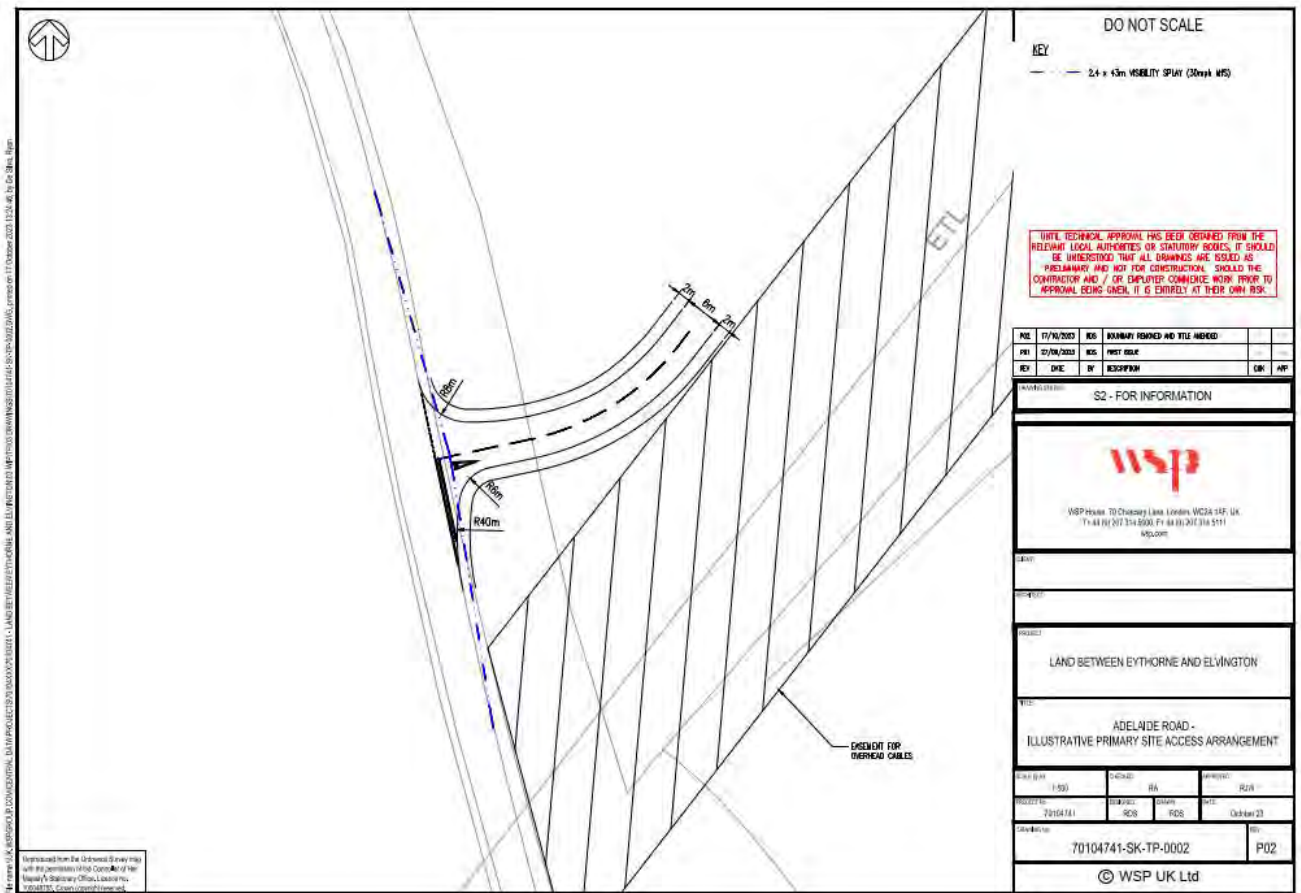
Adelaide Road- Illustrative Primary Site Access Arrangement
